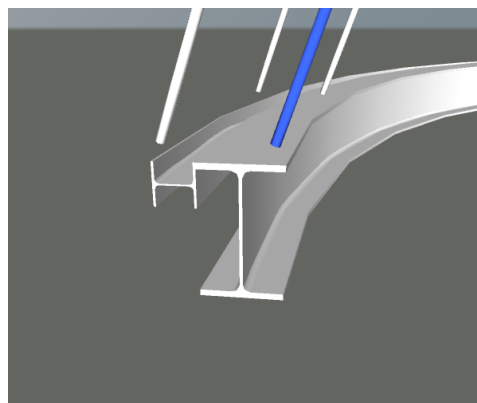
Modeling detail- cone section: connection of the cone's beam and cables are not modeled. (Retrieved from 3D model, Witteveen+Bos, 2019)
